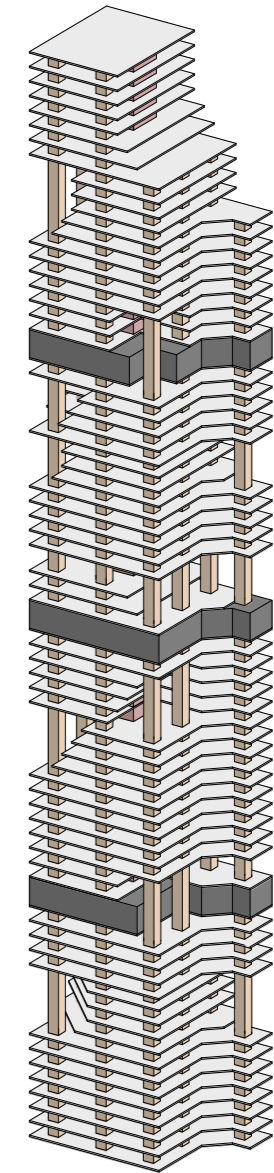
Diagram of the structural system showing the megacolumns, structural core and transfer levels along with the floor slabs.
